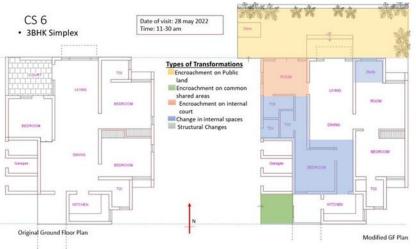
Sample 1- Original and Modified GF plans (Source: Author)
